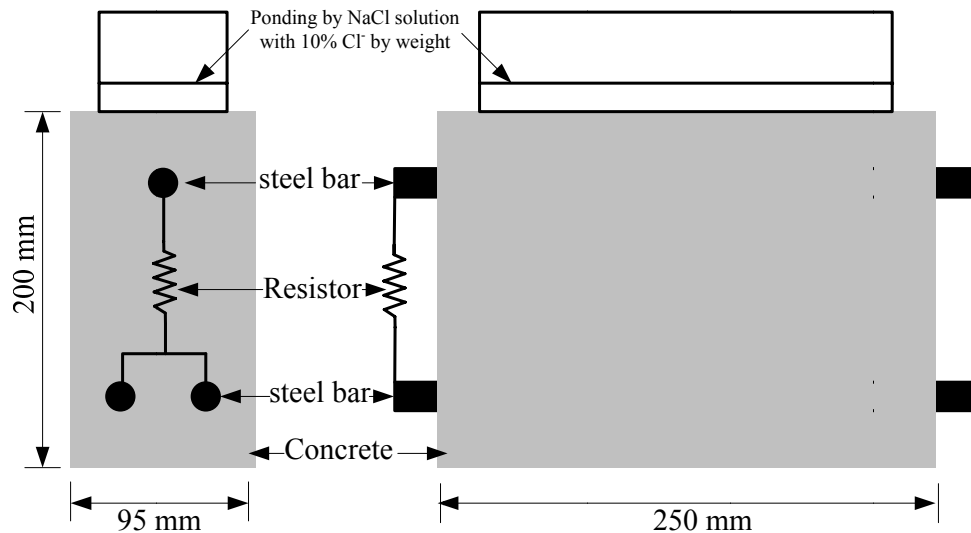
Schematic illustration of specimen exposed to chloride.
